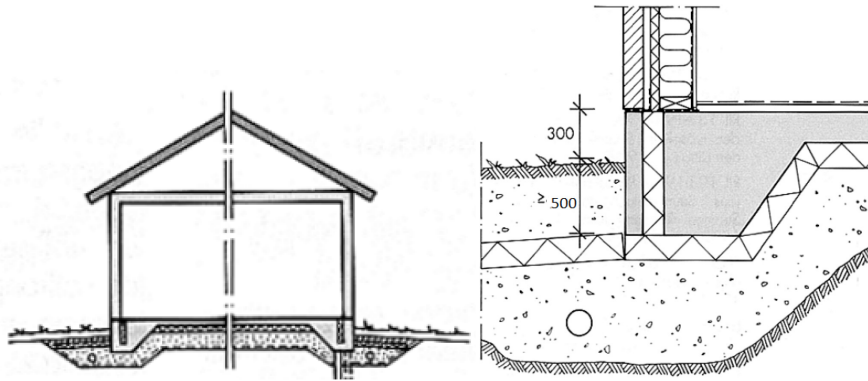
and 5. Stiffened raft-slab foundation (left), Minimum level above the ground and minimum foundation depth (right) (RT 81-10486, 1992).
